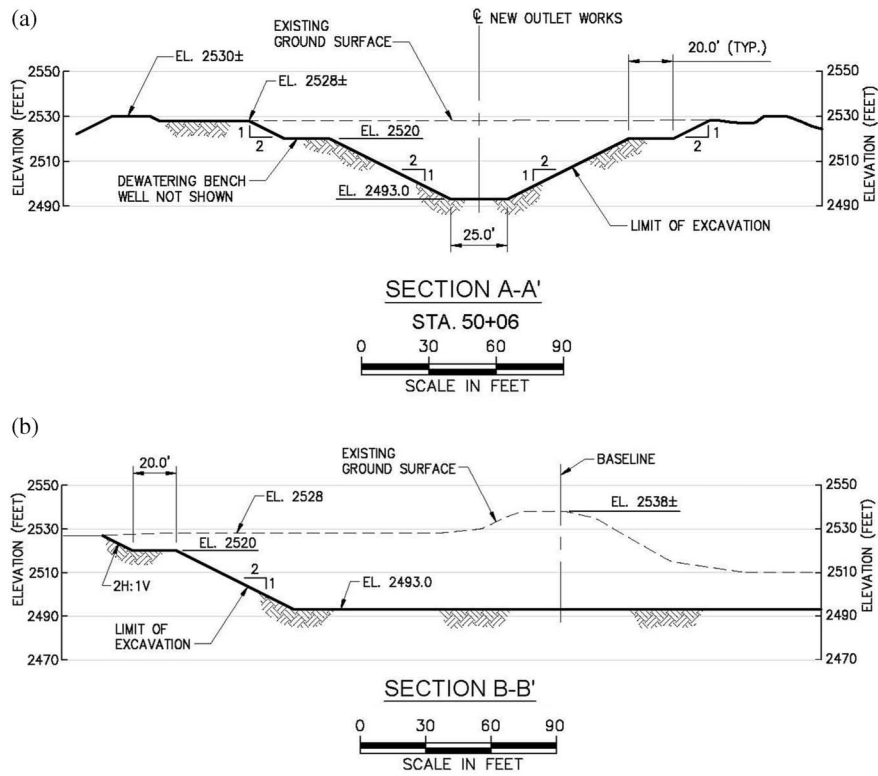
S-1. Outlet Works Excavation for (a) Section A-A' and (b) Section B-B'
